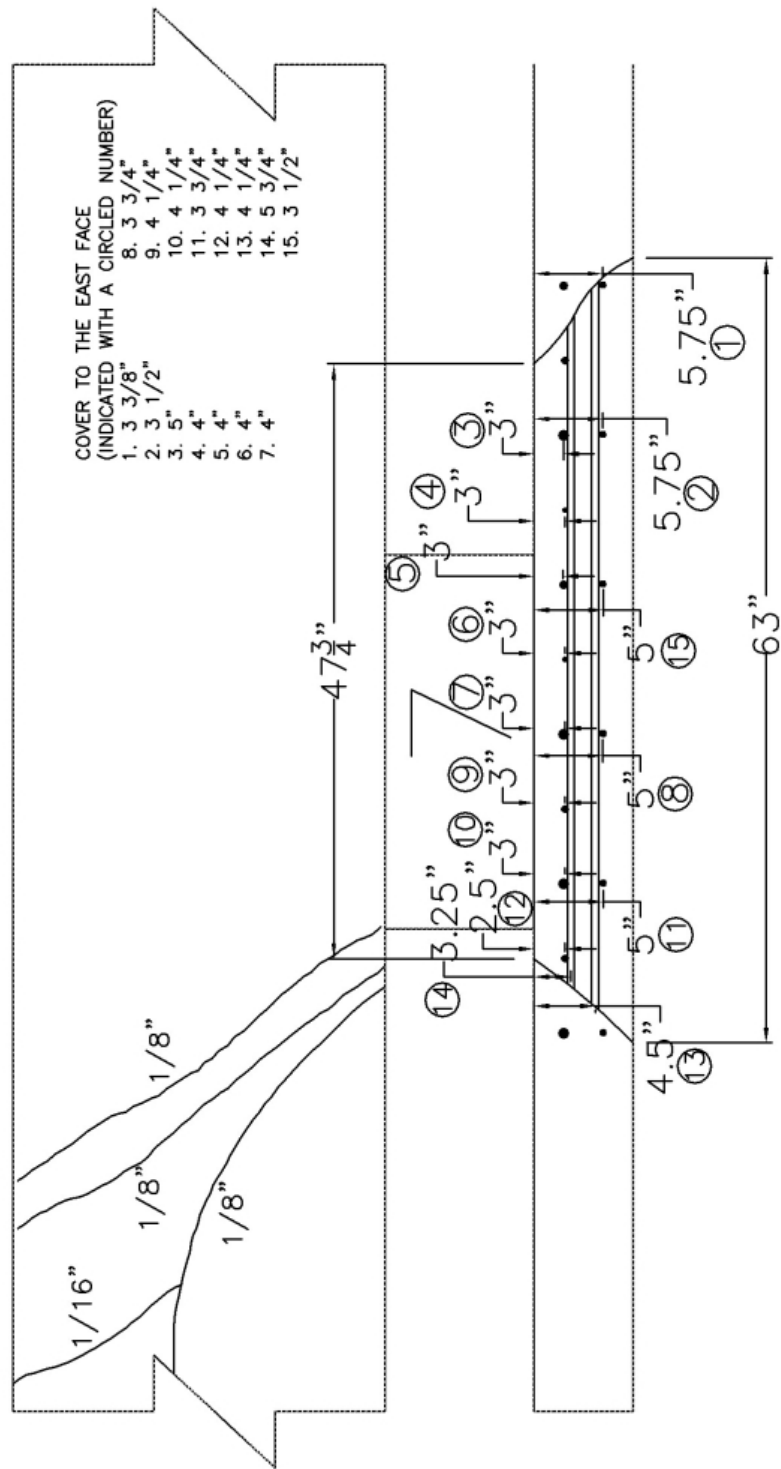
Concrete Damage – Back-side of Rail at Post No. 6, Test ACBR-1
